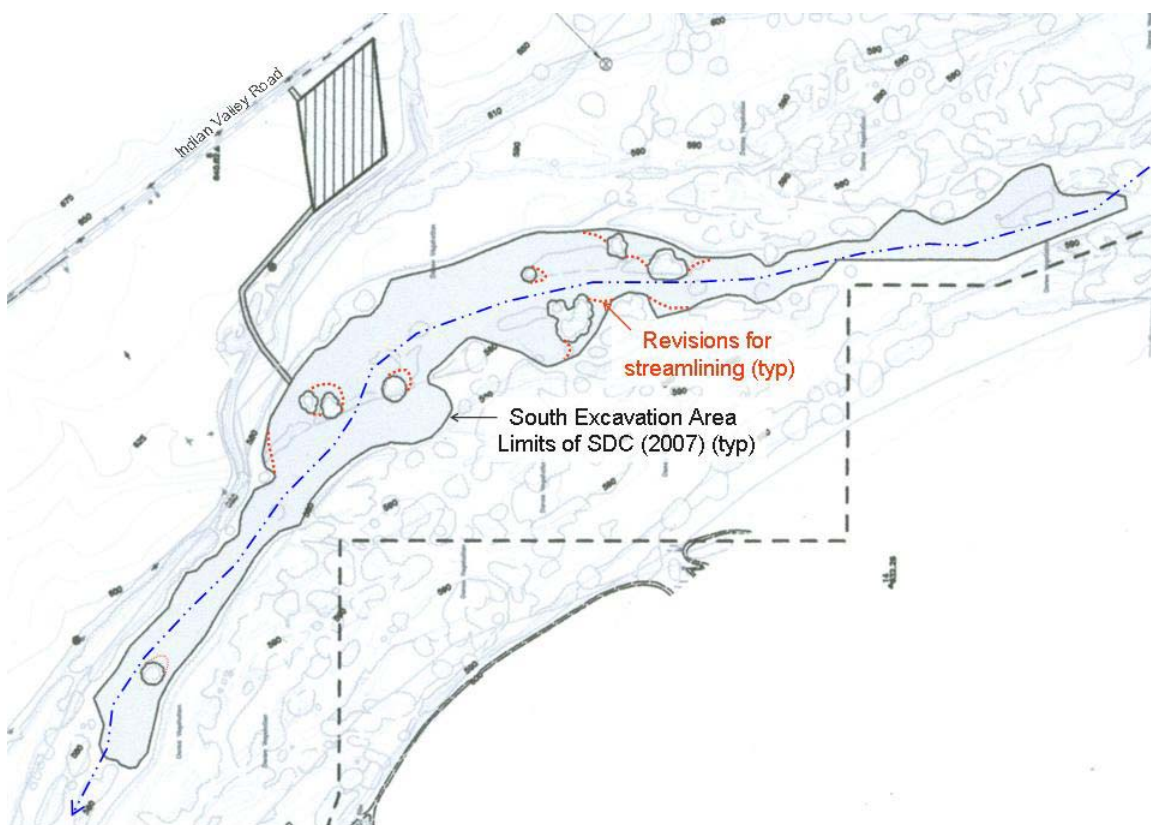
Detail from Site Plan showing excavation area limits in the south excavation area proposed by SDC (2007). The irregular planform of the excavation area limits results from horizontal setbacks from existing channel and island banks and riparian tree driplines. Also see the proposed revised excavation area boundaries in Appendix A.
